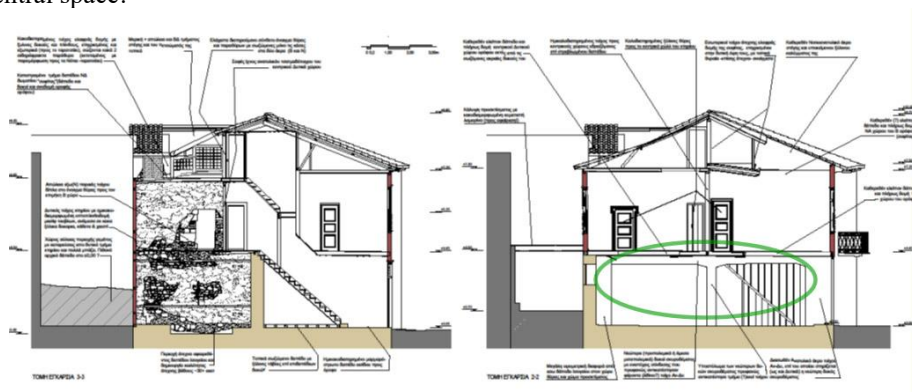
Transverse Sections of Terzaki, showing Ground floor, 1st floor, and Attic floor (B) (the green ellipse, on where the newer reinforced concrete beam and pillars had been put, to expand ! ground floor shops area !!!)
